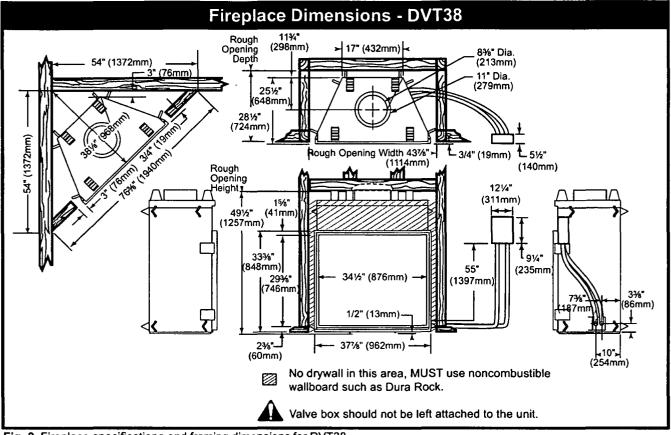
Fireplace specifications and framing dimensions for DVT38.
